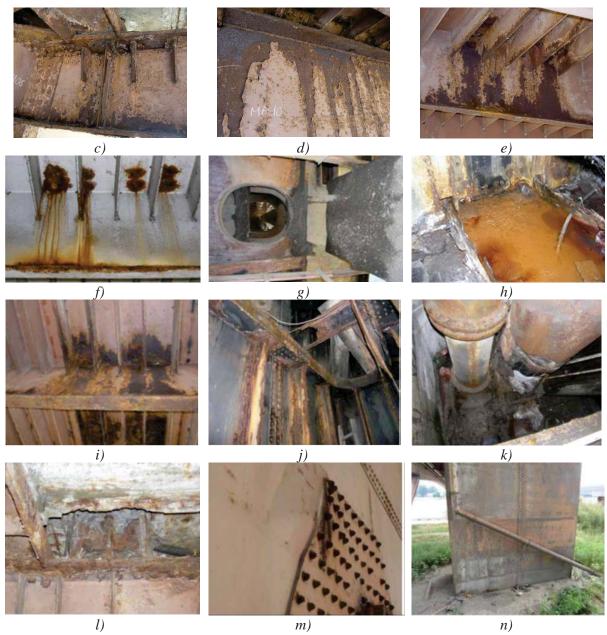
Degradation of steel structural parts. Examples of corrosion damage of steel bridges [11] (continued)
